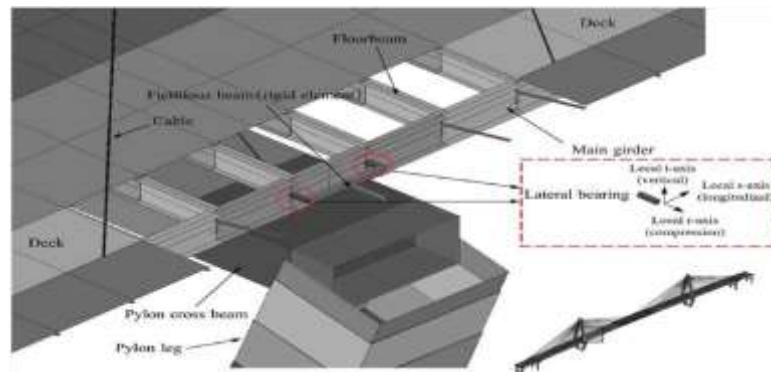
Lateral elastomeric bearings connecting girder members to pylons.
